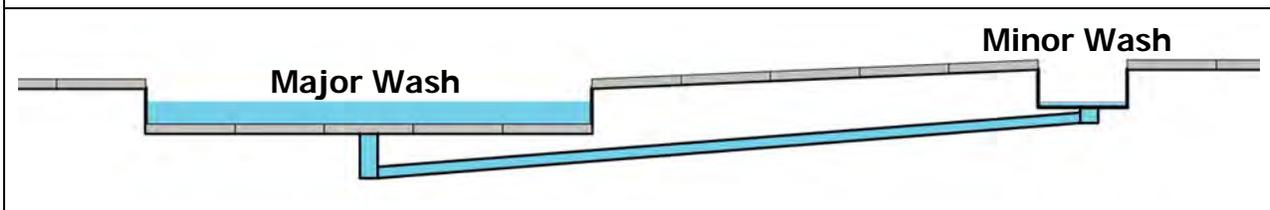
Scenario 37: Plan View of the Test Model – Elevation
